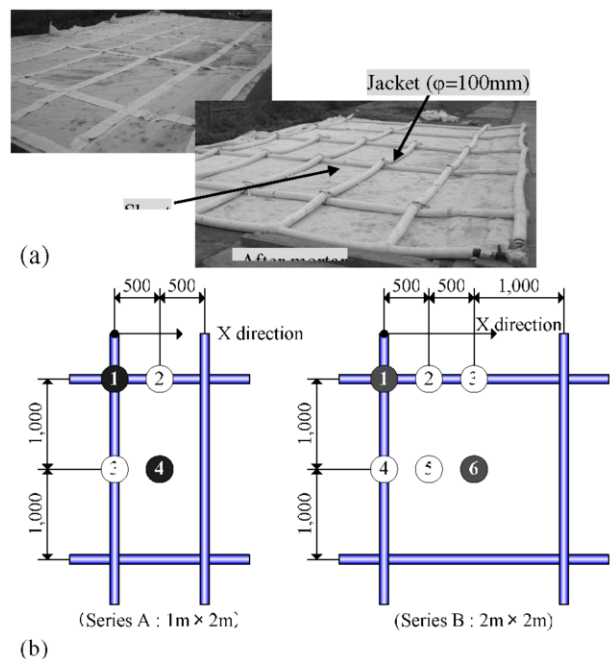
(a) Structuring of lattice frame by mortar injection (b) Integrated arrangement of test points (Unit: mm) (Source: Fig. 5, Okamoto et al.)
